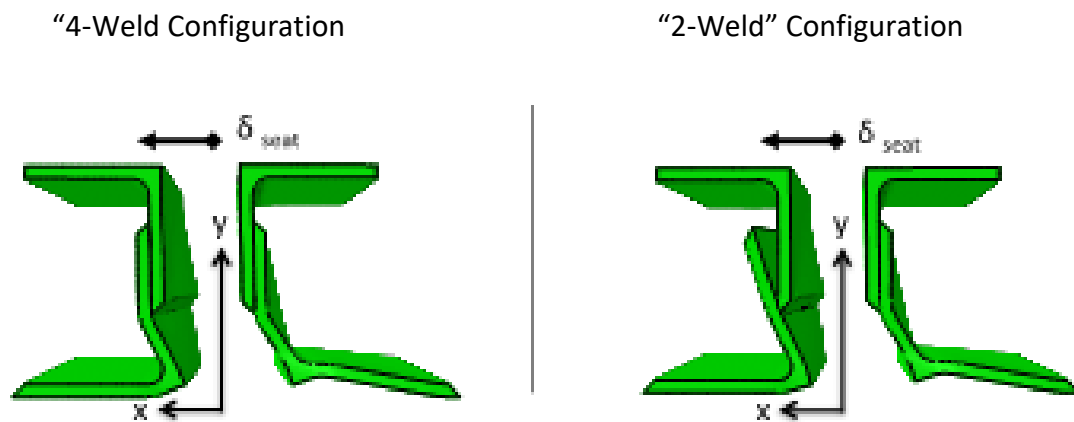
Deflection Assemblies of "2-Weld" and "4-Weld" Configurations
